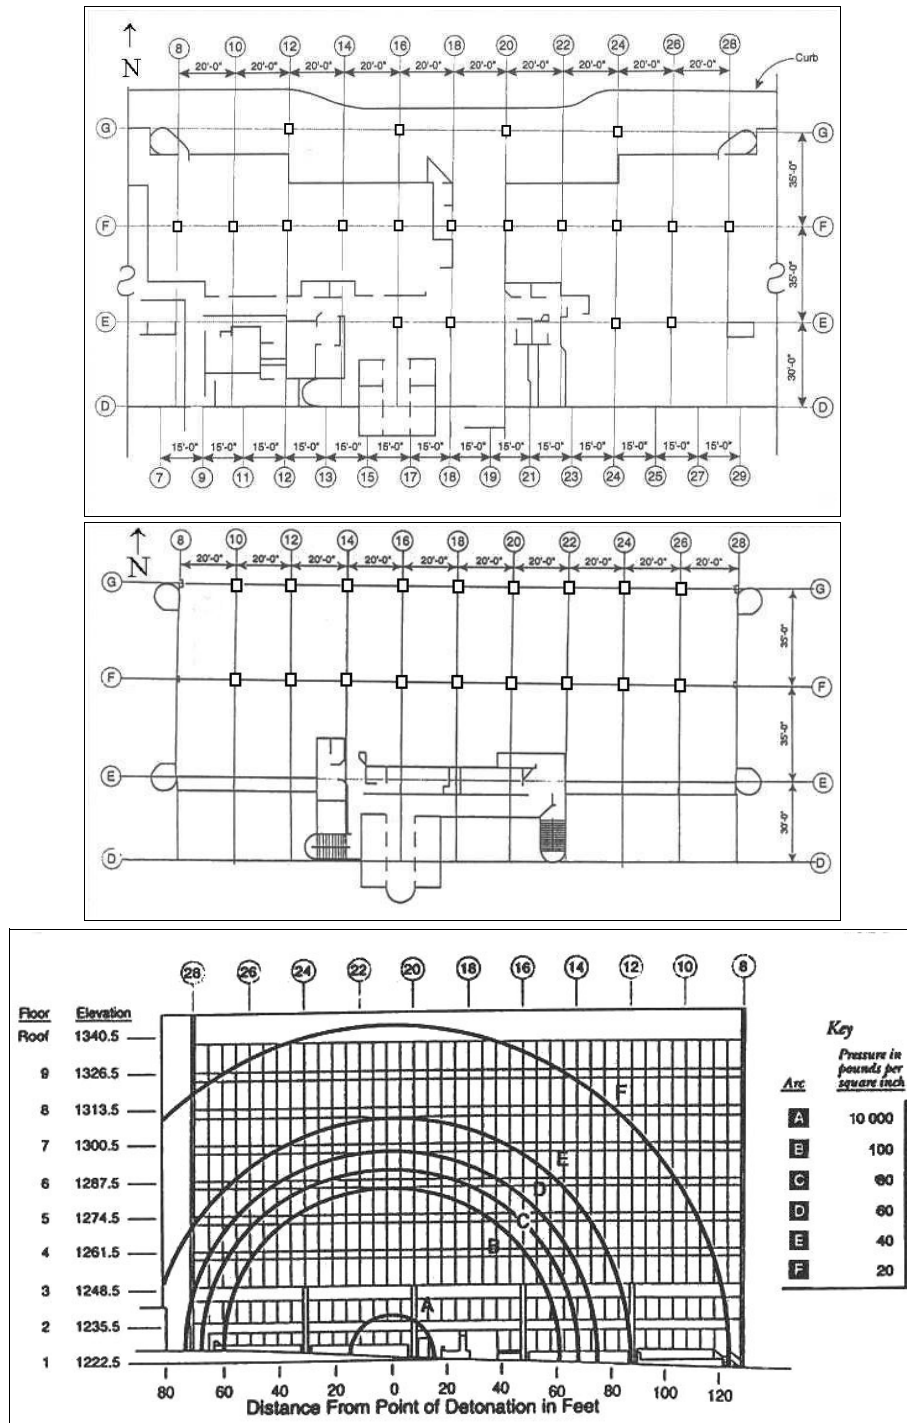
A.P. Murrah Building. (Top) Floor plan of the ground floor. (Middle) Floor plan of the upper floors. (Bottom) Front view of the north facade and peak overpressures of the bomb explosion. (Source: [11]).
